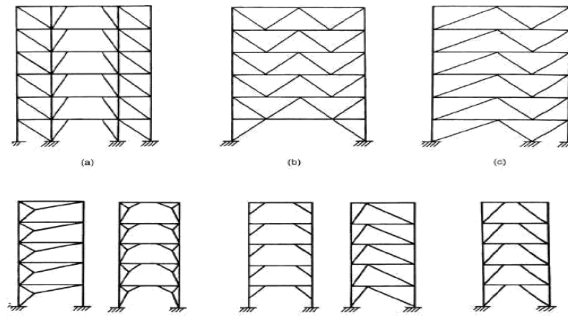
Brace configuration that allows for door-size openings in interior space layouts.
